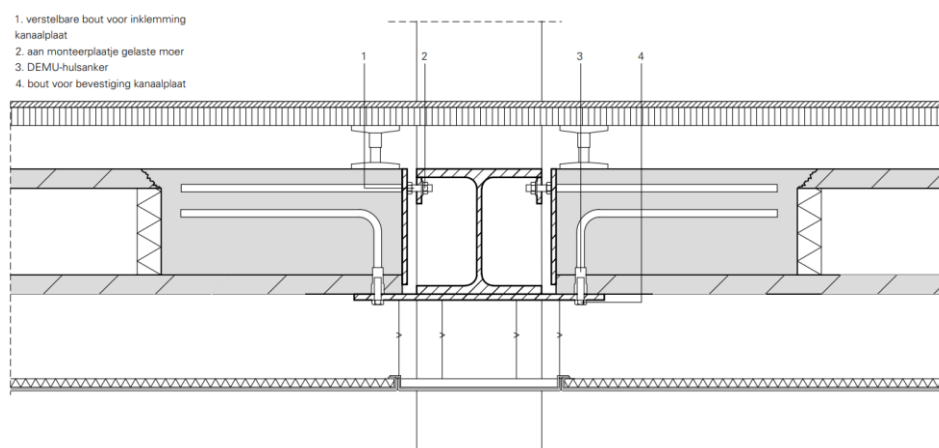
Hollow core slab and steel beam in the Temporary Courthouse (De Danschutter et al., 2017). This is a demountable connection as the top floor can be demounted from the hollow core slab.
